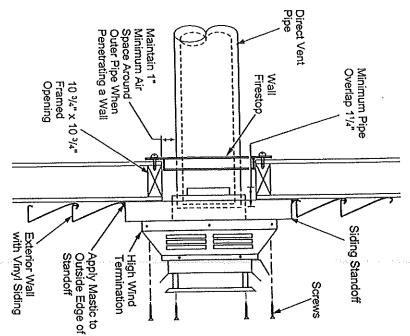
Typical Horizontal Termination Cap Mounting with Additional Siding Standoff Installed
